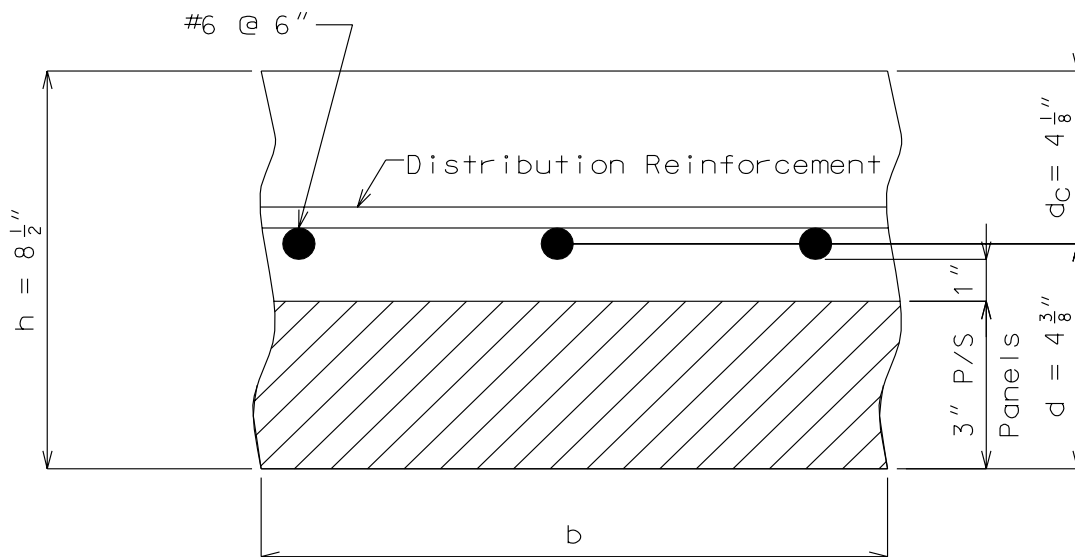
Example Slab Cross Section for Cracking Check
